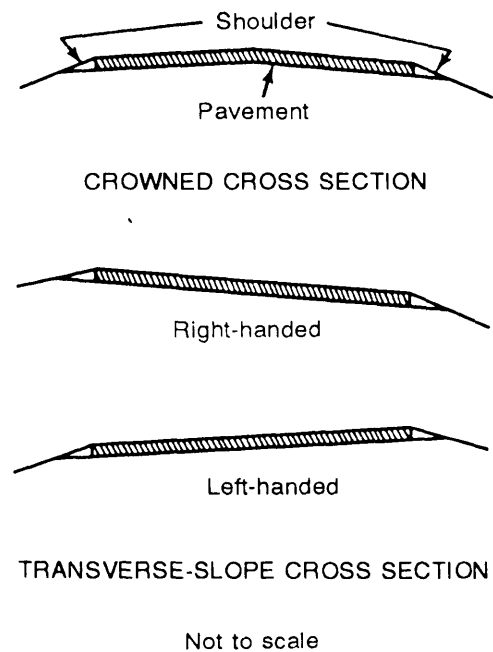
Crowned cross section and transverse-slope cross sections of runways
